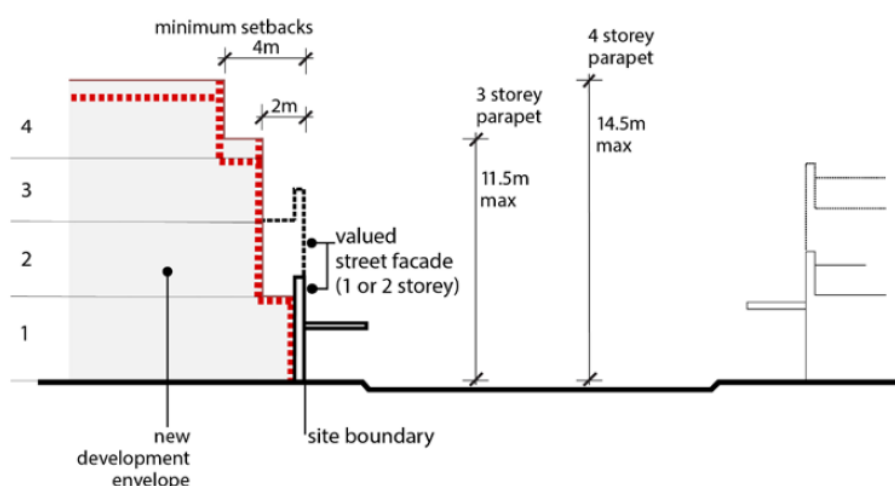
Front setbacks with retained in Area 2 (source: Exhibited DDO21)
